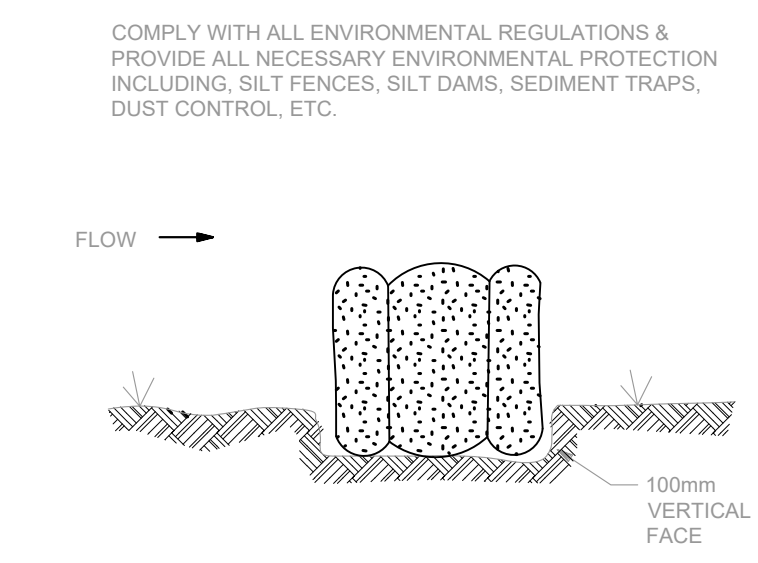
, 11 & 12 ARE TO BE READ IN CONJUNCTION WITH ENVIRONMENTAL PROTECTION NOTES. EROSION CONTROL MEASURES ARE TO BE IN PLACE BEFORE ANY WORK ON SITE BEGINS AND ARE TO REMAIN IN PLACE UNTIL THE WORK OF THIS TRADE PACKAGE IS STABILIZED, (NO SEDIMENTARY RUN OFF TO AREAS OFF SITE IS ACCEPTABLE.)
